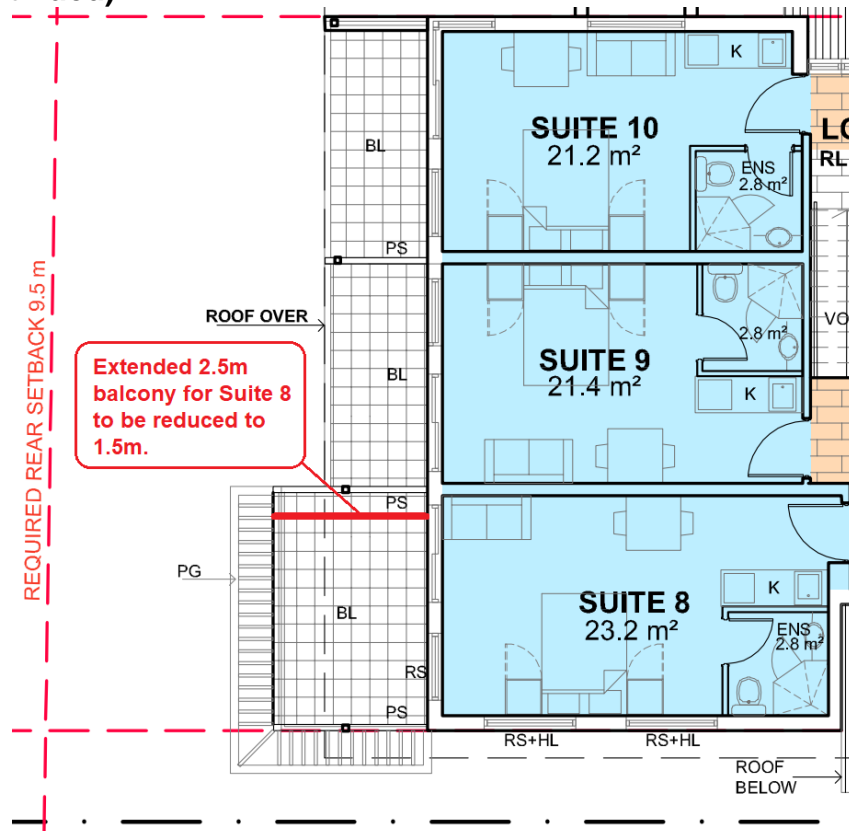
Extract if the first floor plan showing the balcony to Boarding Room 8 which is to be reduced in its northern extend to ensure privacy is maintained. The height of the privacy screen to this balcony is also recommended to be increased to 1.7m by way of a consent condition.
